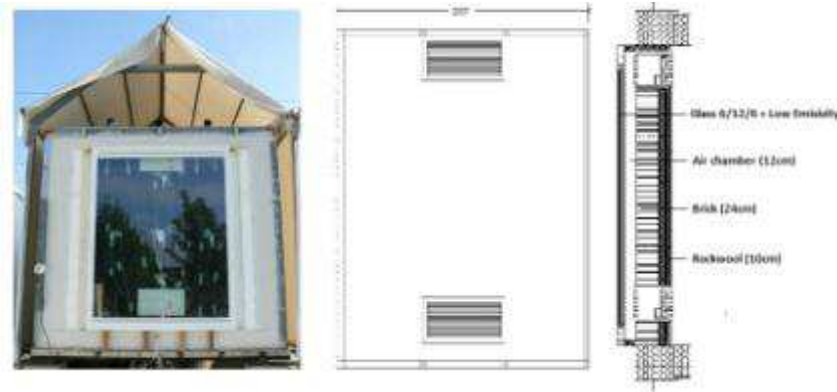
Trombe wall facade and the construction solution of the sample
